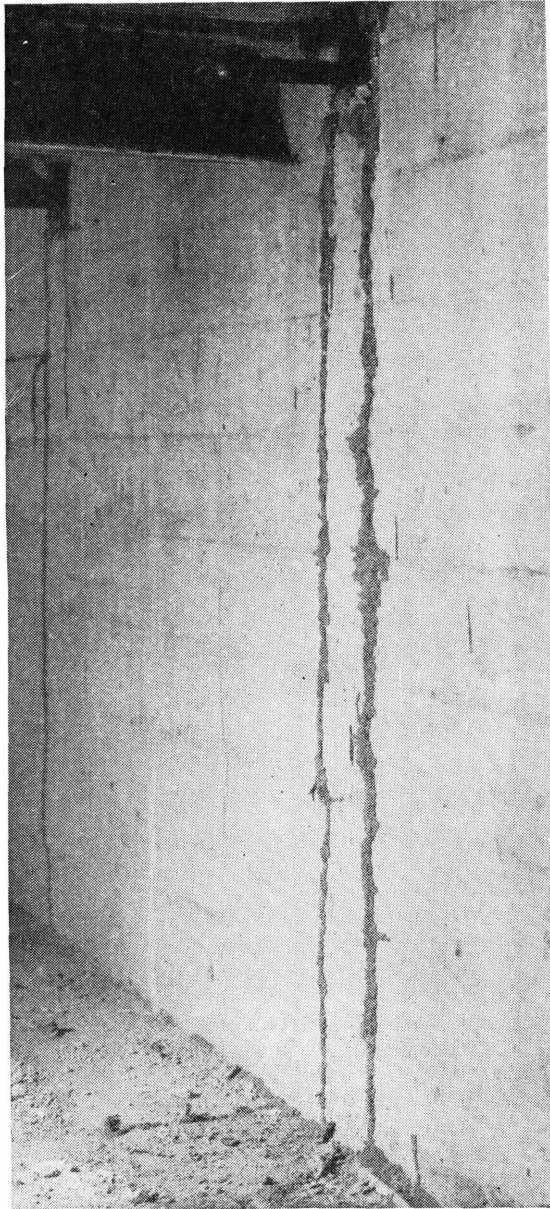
Termite shelter tubes extending down over poured concrete wall, connecting wood and ground. Form boards left in place around openings for pipes attracted termites from the soil outside the foundation.
